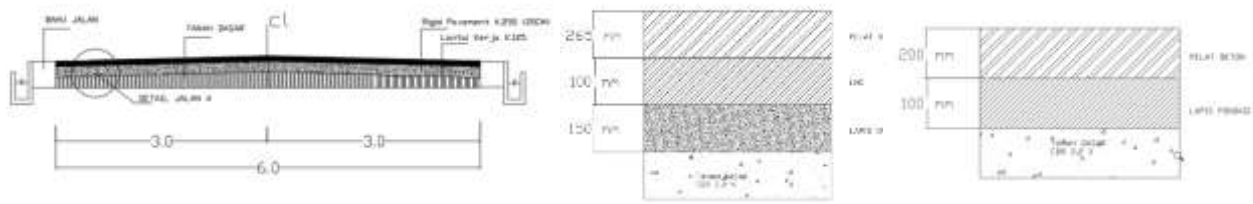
Cross-section of the road, Thickness of Rigid Pavement with Road Pavement Design Manual 2017 and Thickness of Rigid Pavement with Pd-T-14-2003
